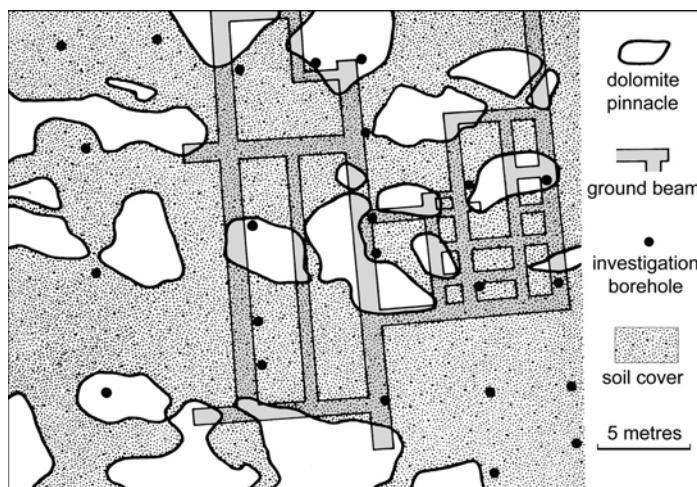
Plan view of ground beams designed and extended to reach stable dolomite pinnacles to support a building at Zeerust in South Africa; soils reached more than 20 m deep between the pinnacles.
